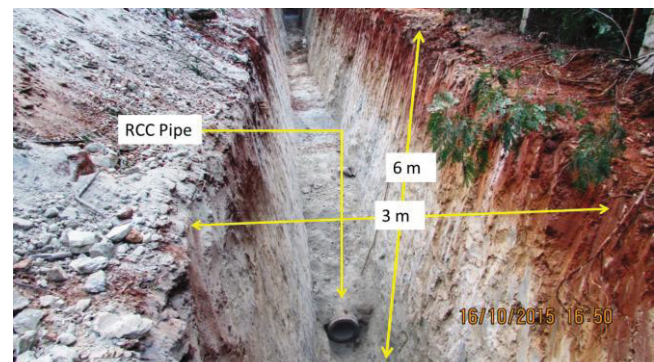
Typical Excavated Trench Section of the Pipeline Project
